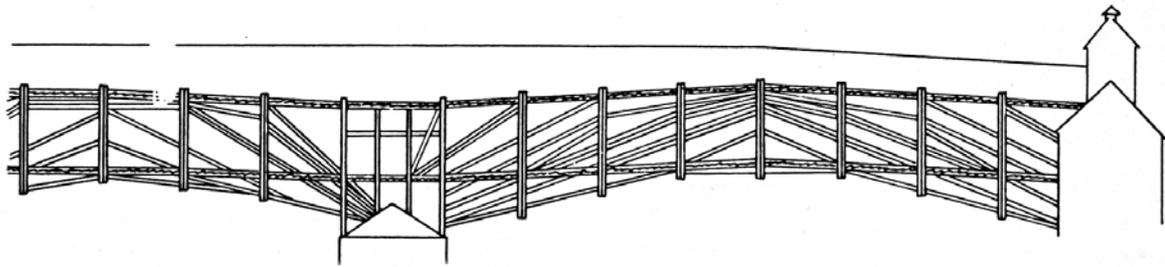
Through-truss with polygonal reinforcement at Meissen, Reuss. The right side was built in 1764 and the left in 1784. (James²)
